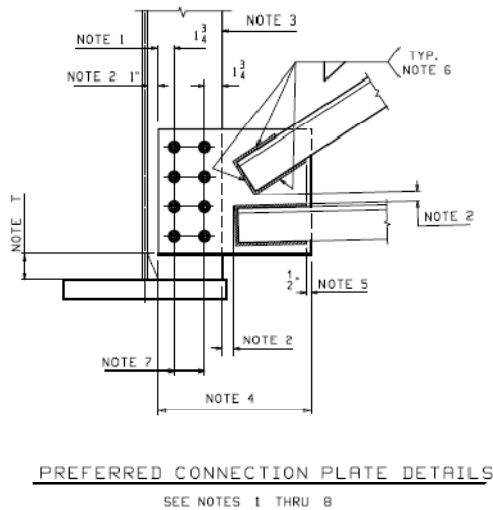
Standard Cross-Frame Connection Detail (AASHTO/NSBA, 2006)
